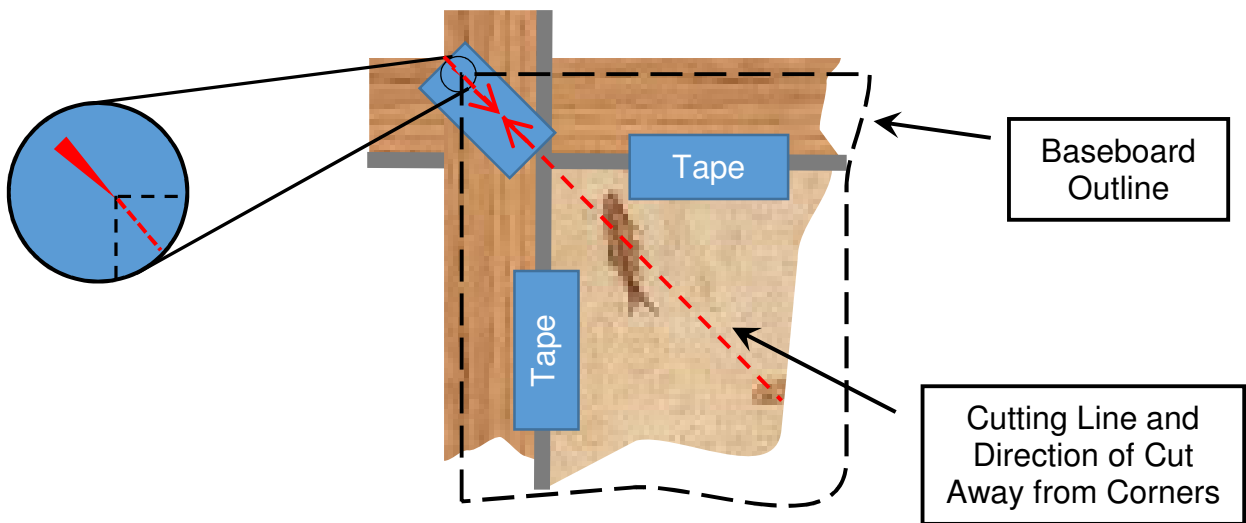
Side View of Workpiece Showing Knife Position
